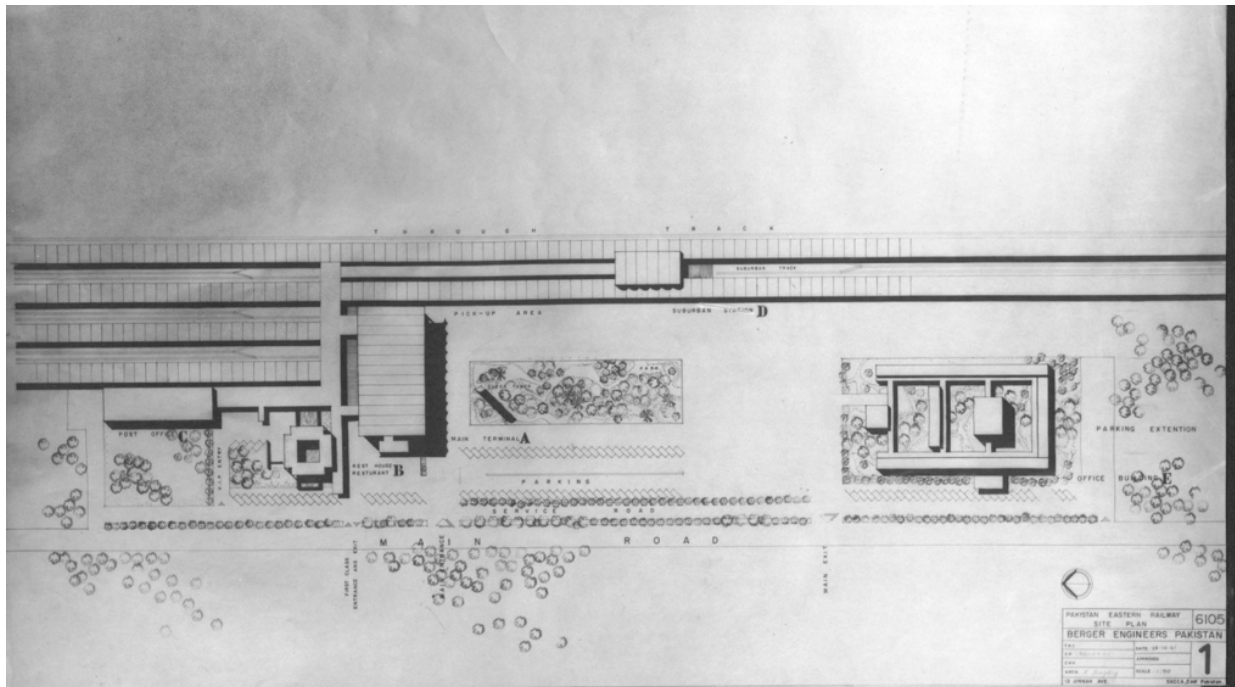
Masterplan of Kamalapur Railway Station. (Source: Katherine Dunham)
